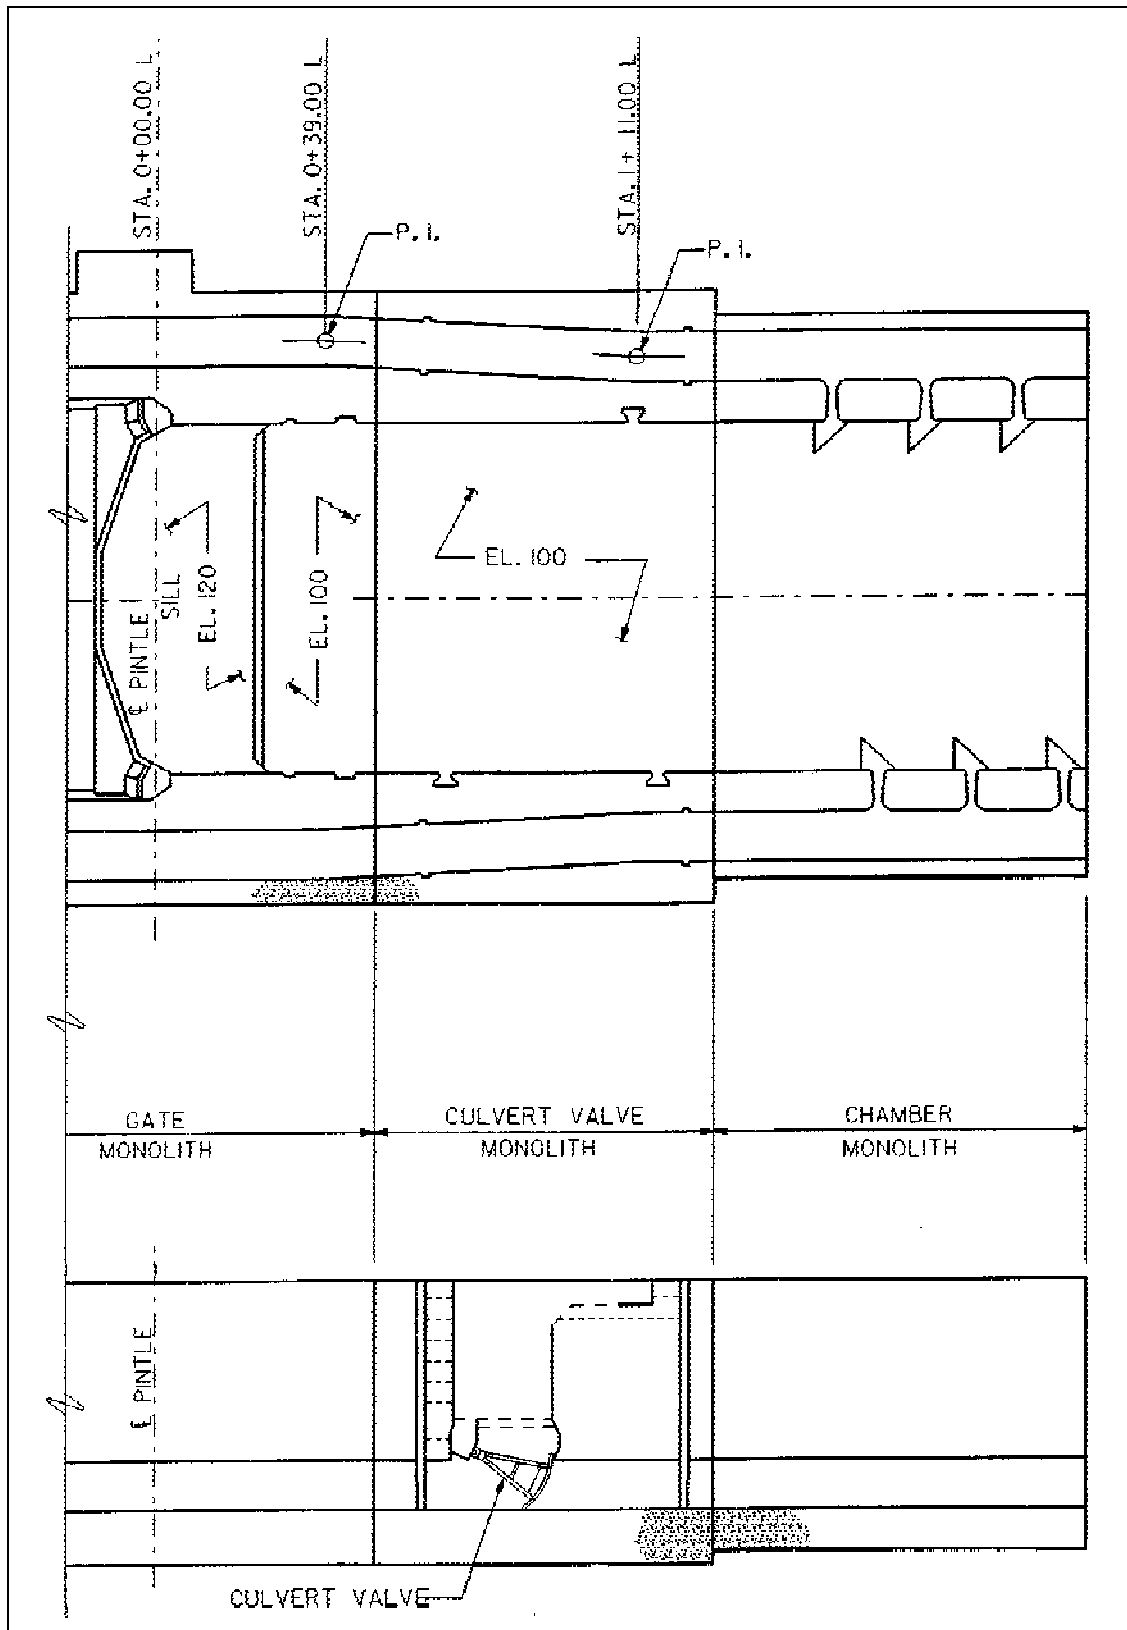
Culvert valve transitions monolith. Plan view and elevation
